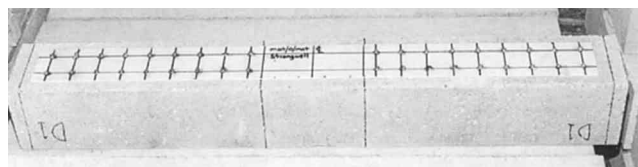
Composite strip attached to concrete beam using two rows of fasteners and 50.8 mm (2 in.) spacing between fasteners.
